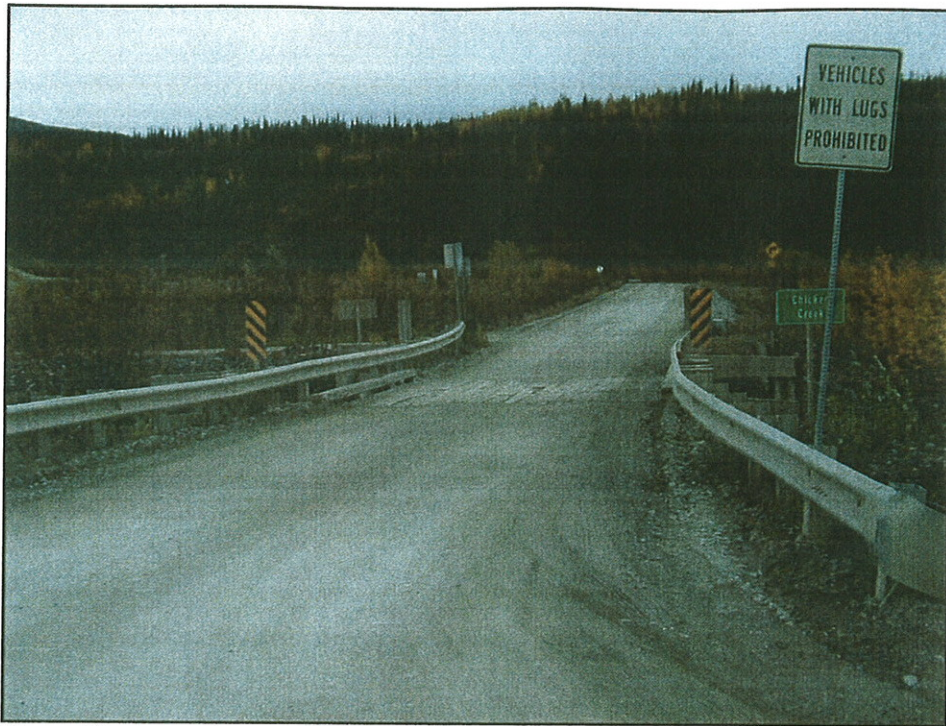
Current Chicken Creek Bridge. Bridge is scheduled to be replaced with a single span two lane bridge. (9/12/02)
